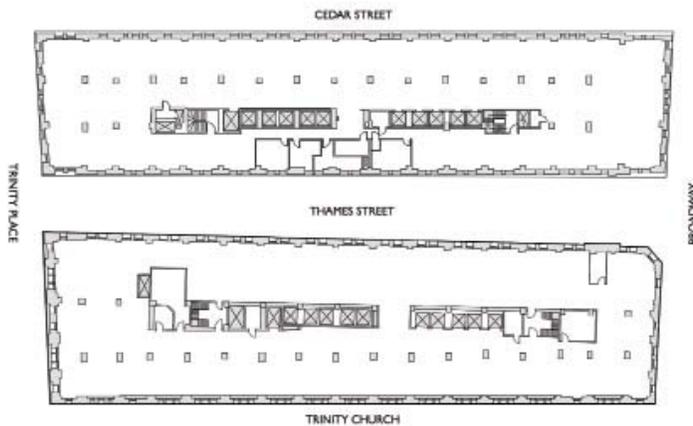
The Trinity and the US Realty Buildings have a long bank of elevators disposed on one side of the corridor
